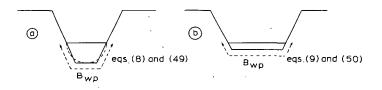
Drainage channels with trapezoidal wet cross-sectional area.
